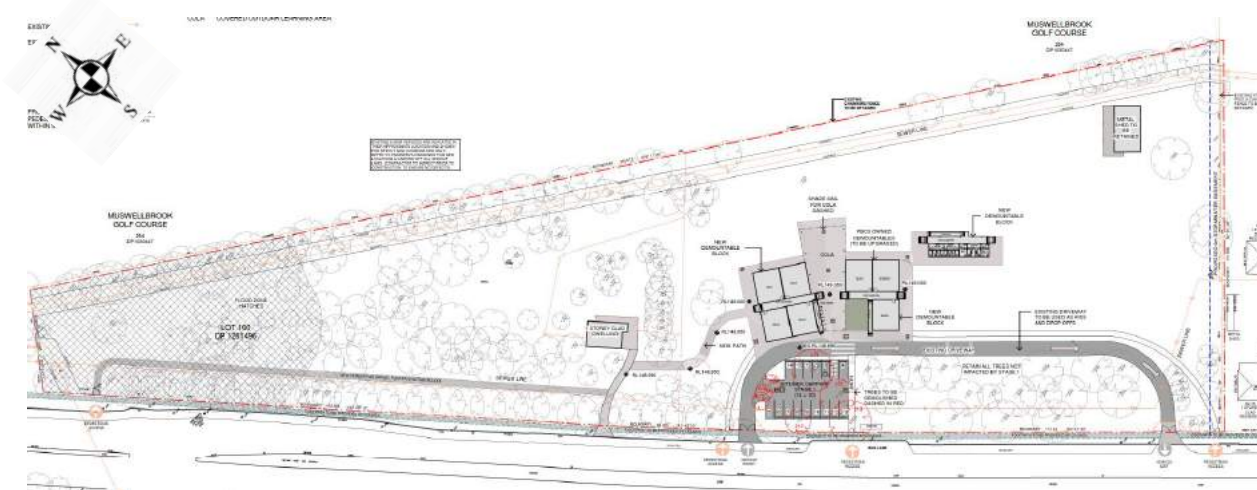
Stage 1 - Site Layout (Source: NBR Architects)
